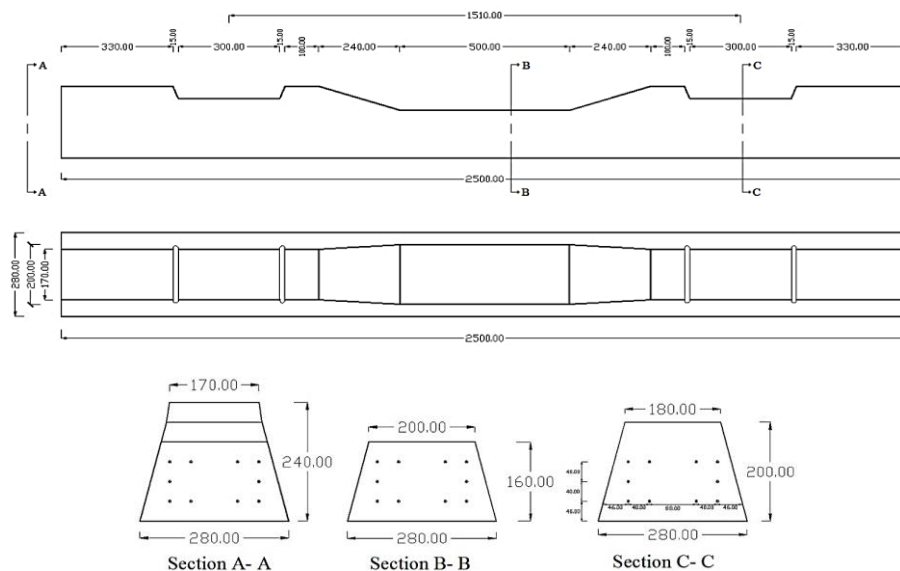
type II- pre stressed concrete sleeper geometry dimension
